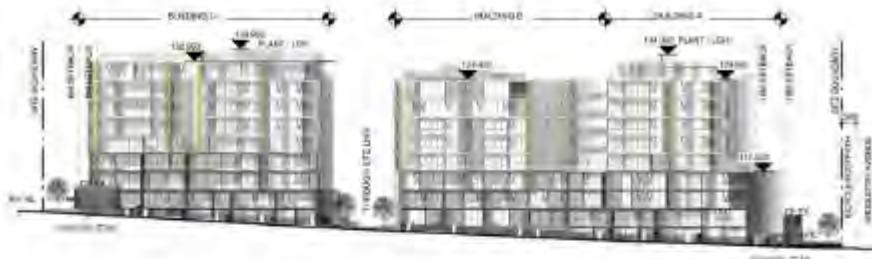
North Elevation – Fishburn Crescent (Source: PTW Architects, 2019)
